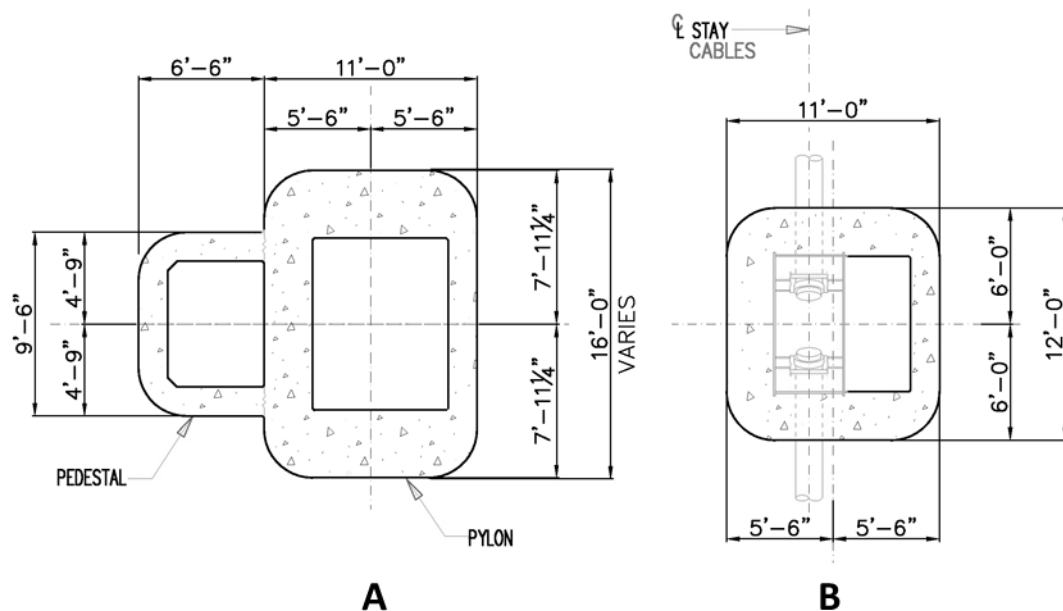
Pylon Configurations and Dimensions (A) at Foundation Level and (B) at Anchoring Level
